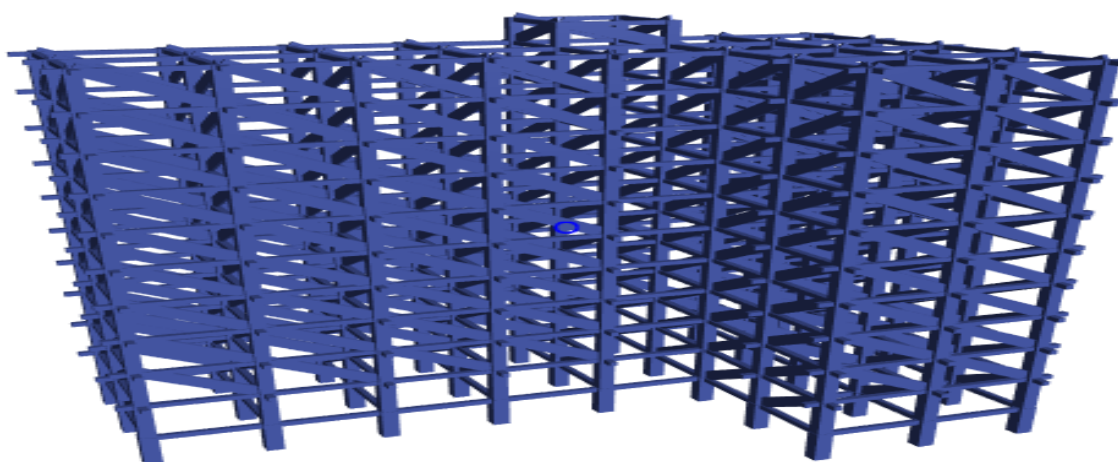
4 Sample of 3-D render view of irregular plan building model
